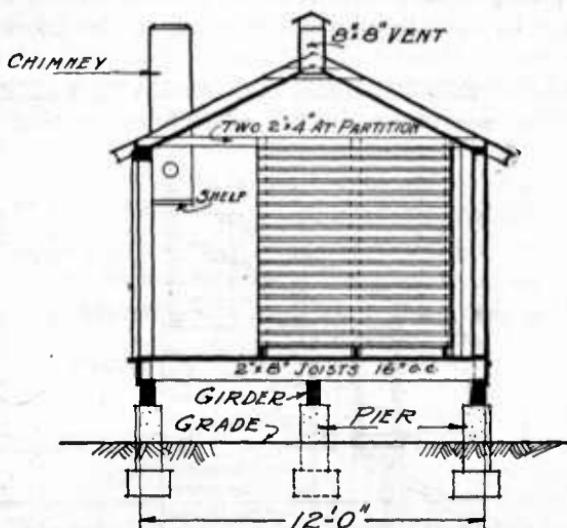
Cross section of a small sweet-potato storage house (12 by 16 feet).
